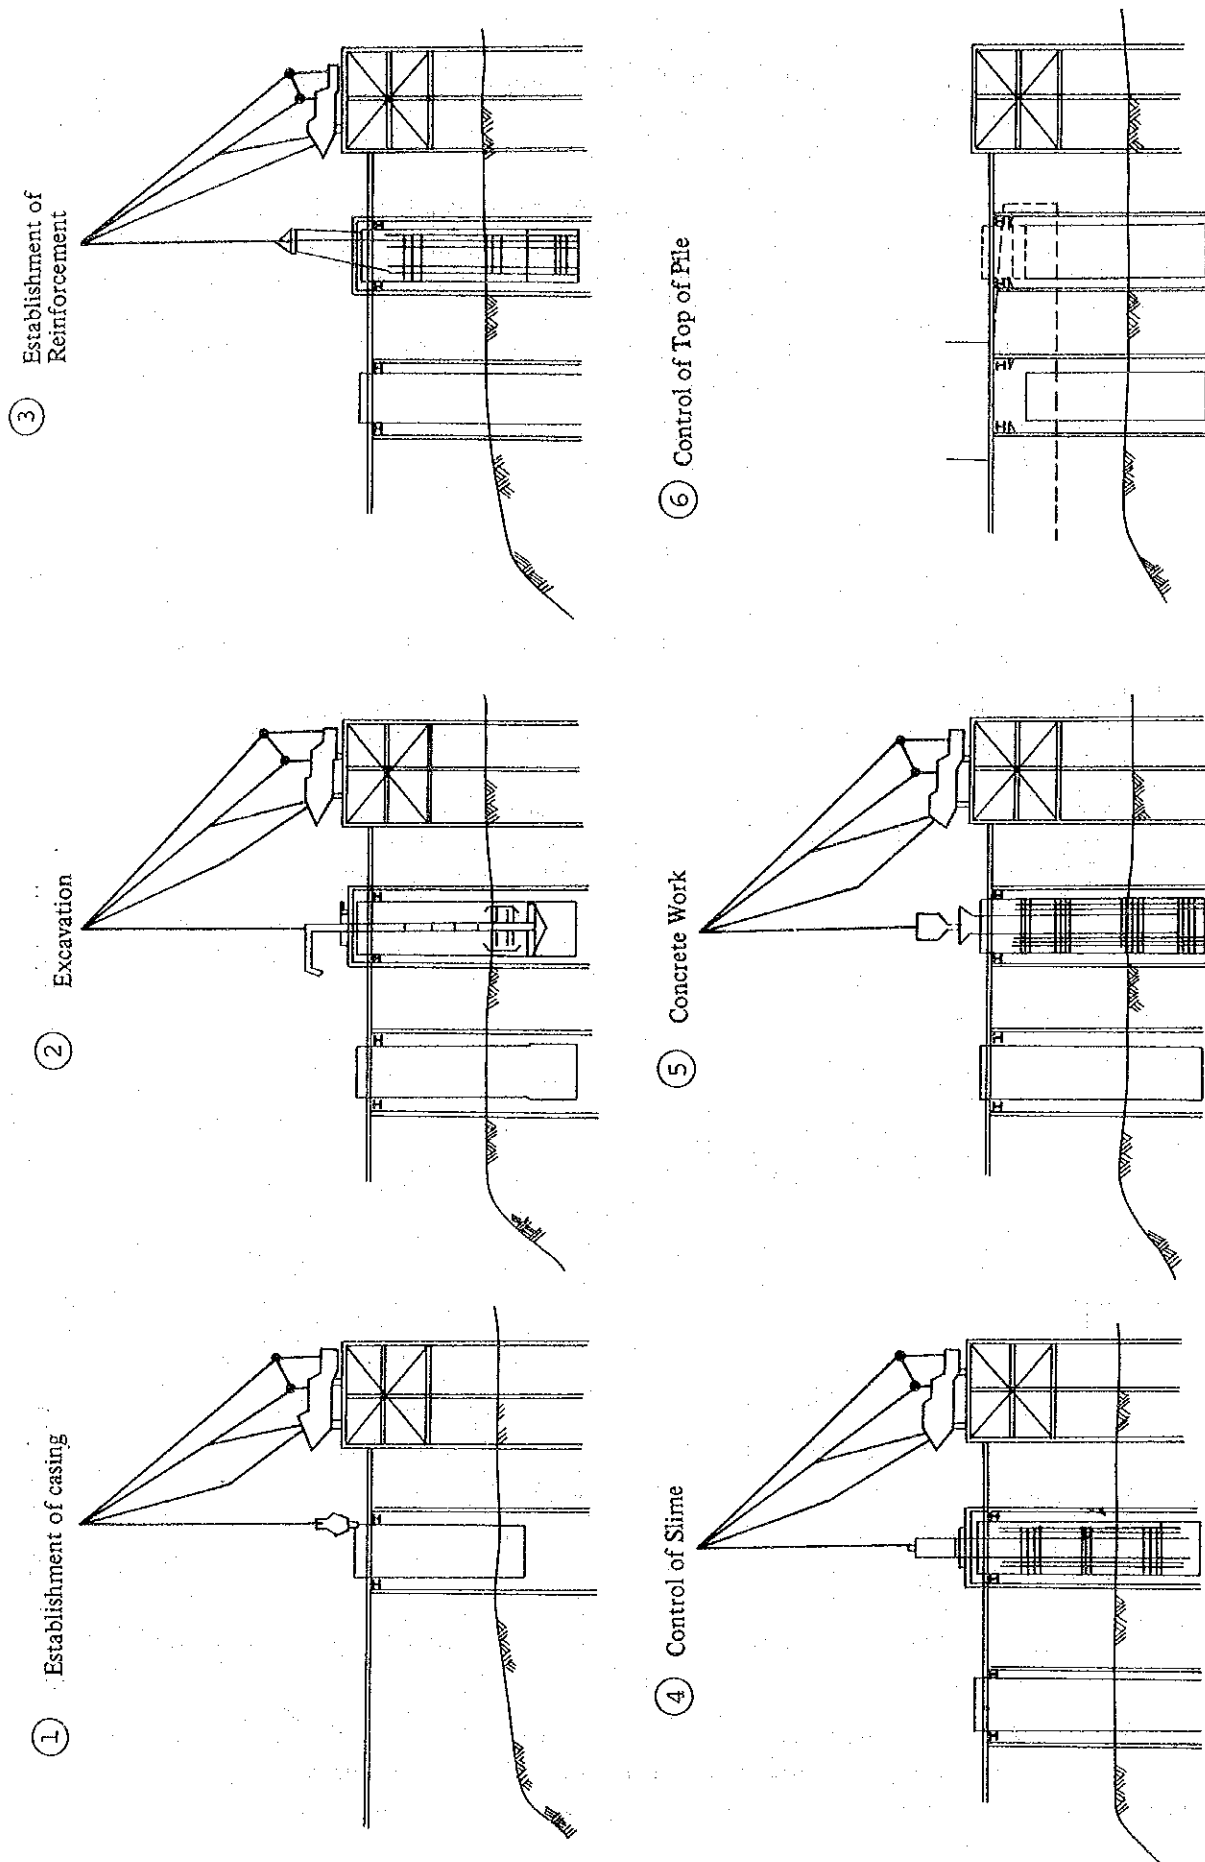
CONCEPTUAL PLAN OF PILE CONSTRUCTION
